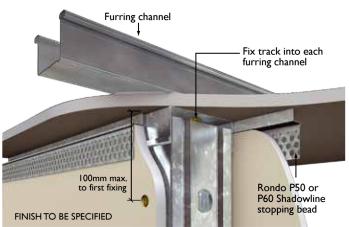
A: WALL/CEILING INTERSECTION DETAIL WITH FRICTION FIT FOR SHADOWLINE APPLICATIONS
